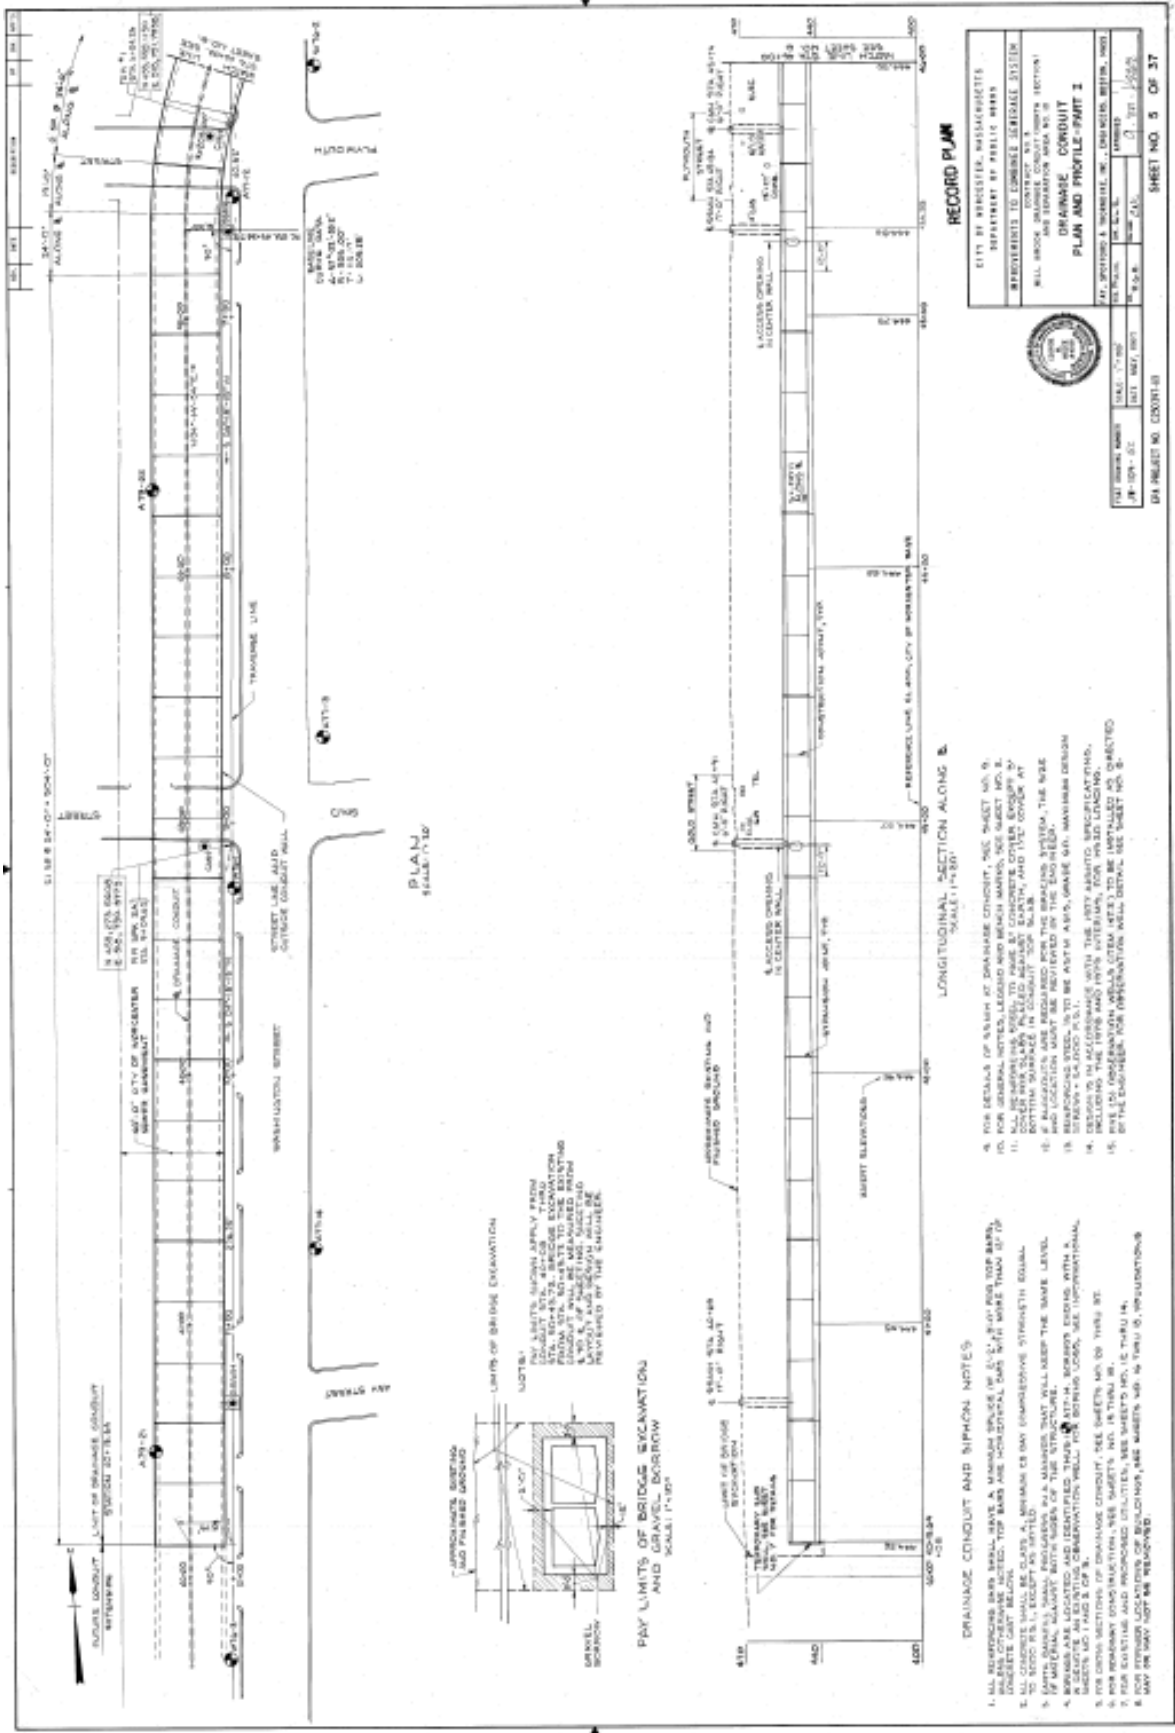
Improvements to Combined Sewerage System Contract No. 3 - Drainage Conduit Plan and Profile Part I
